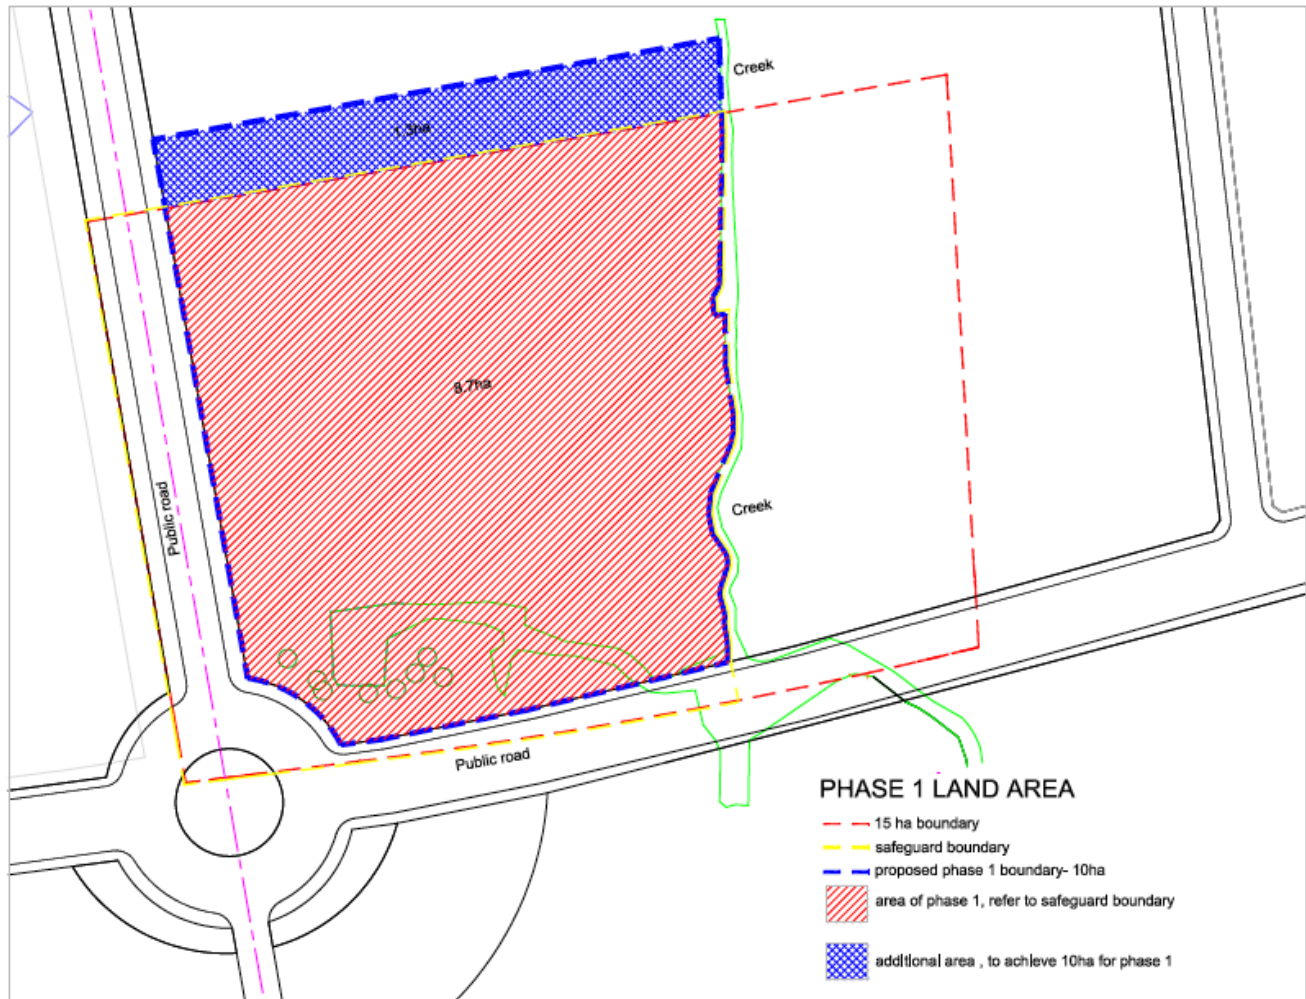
Layout of Phase 1 development of HCMC UMP Second Campus
